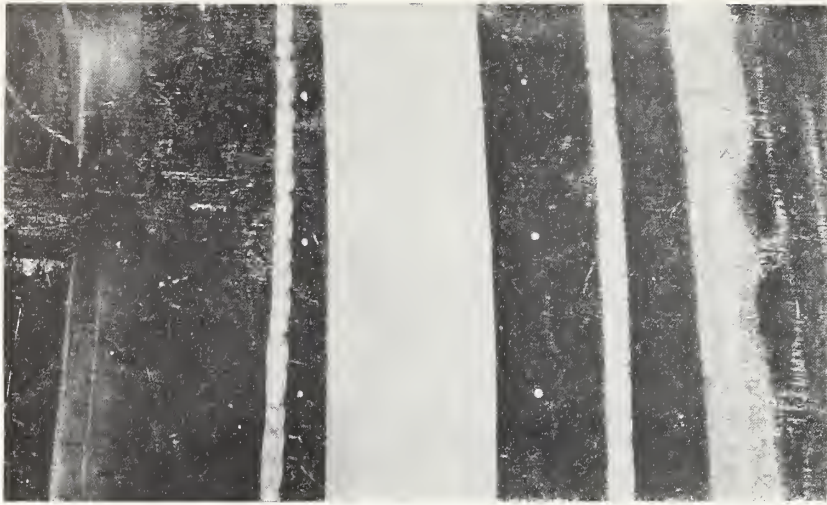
Asphalt and pitch mastic felt base on concrete subfloor (test panel 9L).
